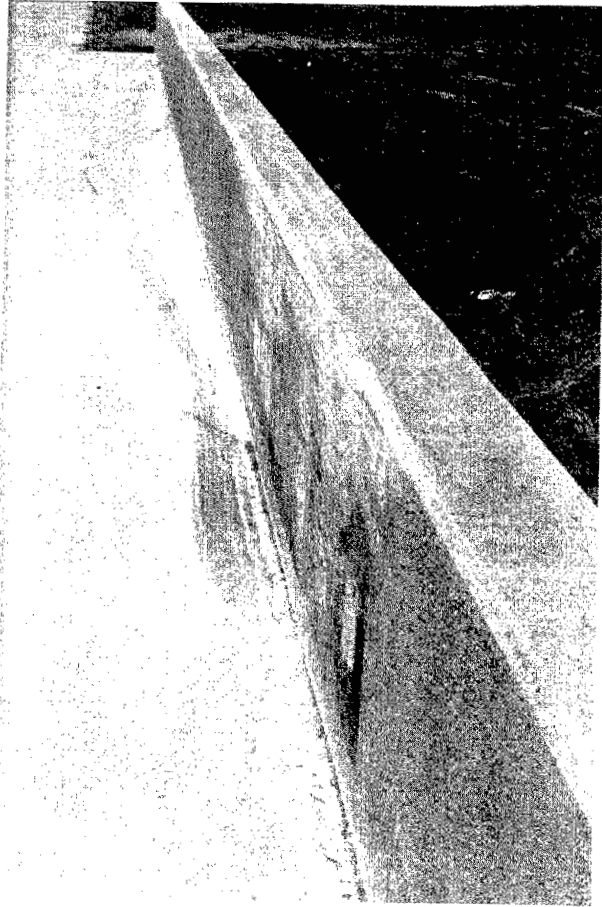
32-in (813-mm) concrete parapet after test 7069-6.
